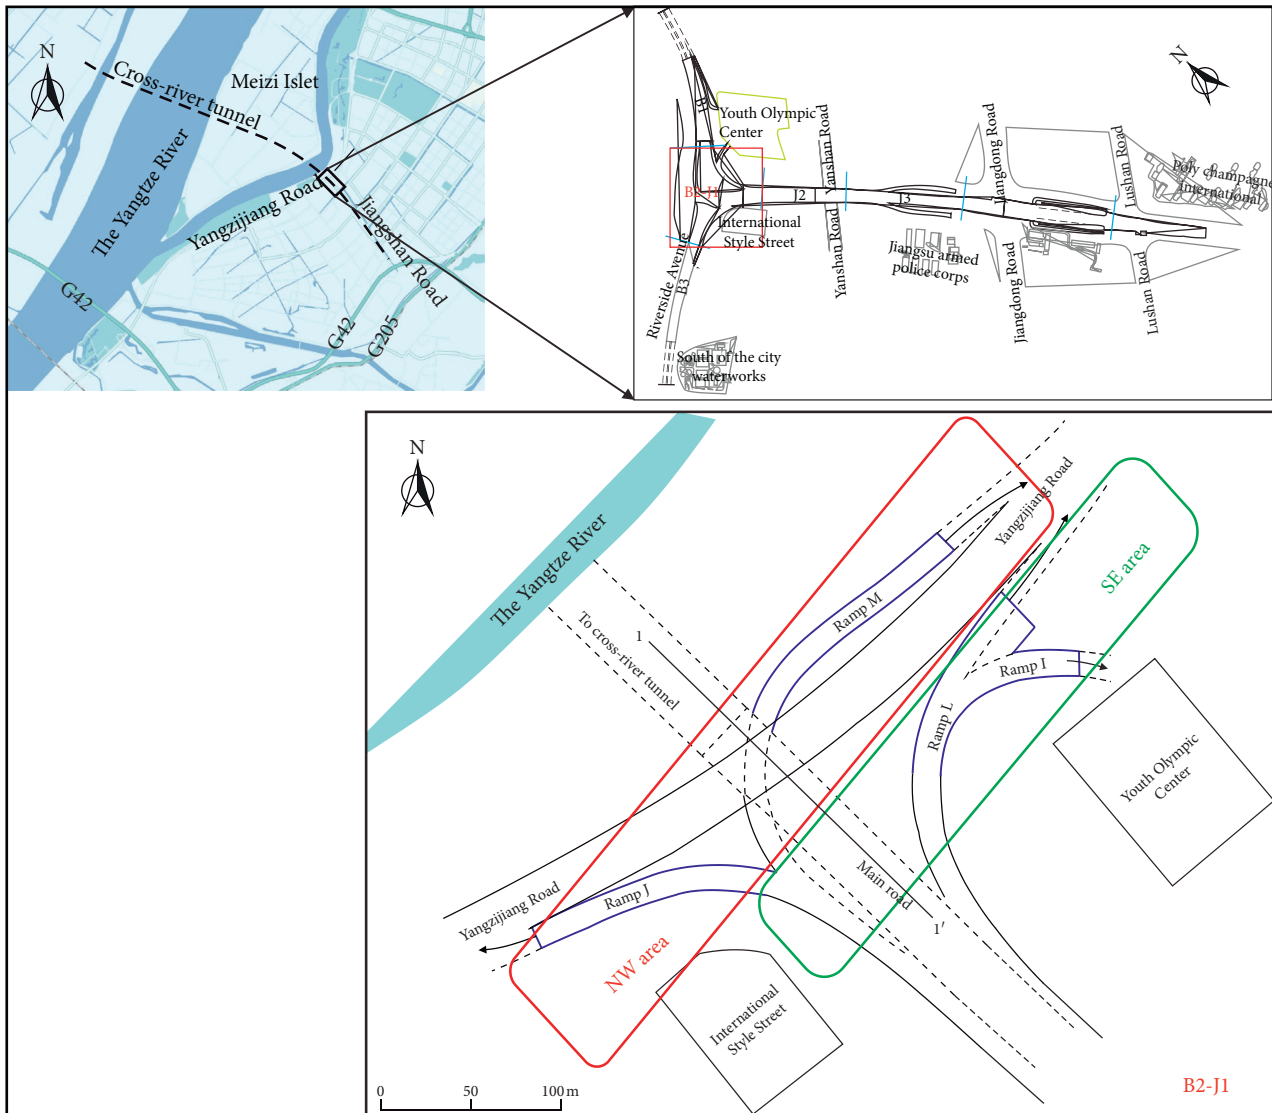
Location and plane layout of the foundation pit of B2-J1.
